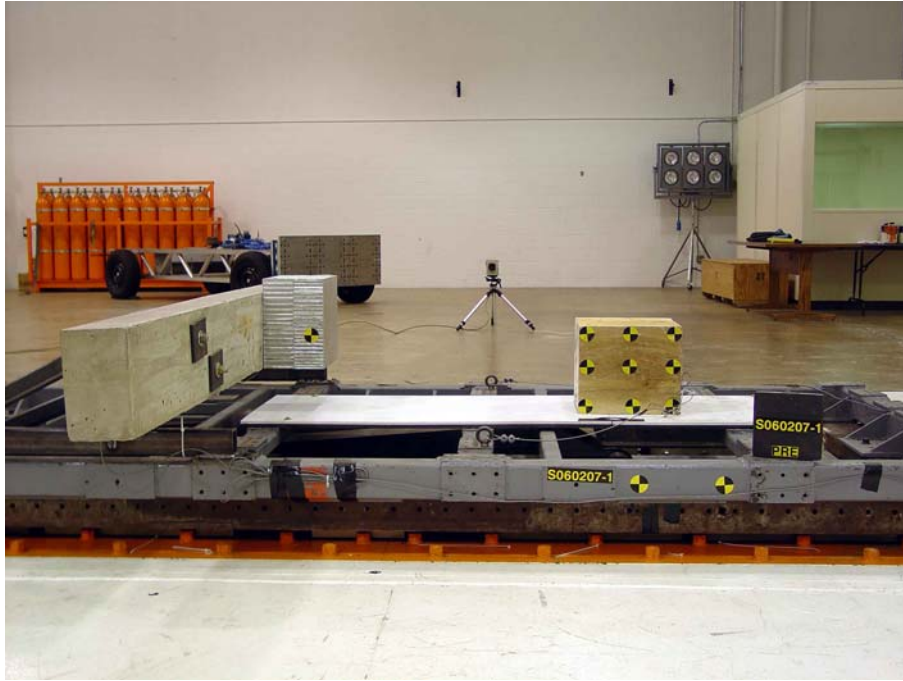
Impact test set-up for concrete beam with I-Lam panel protection (I-Lam/Concrete 1)
